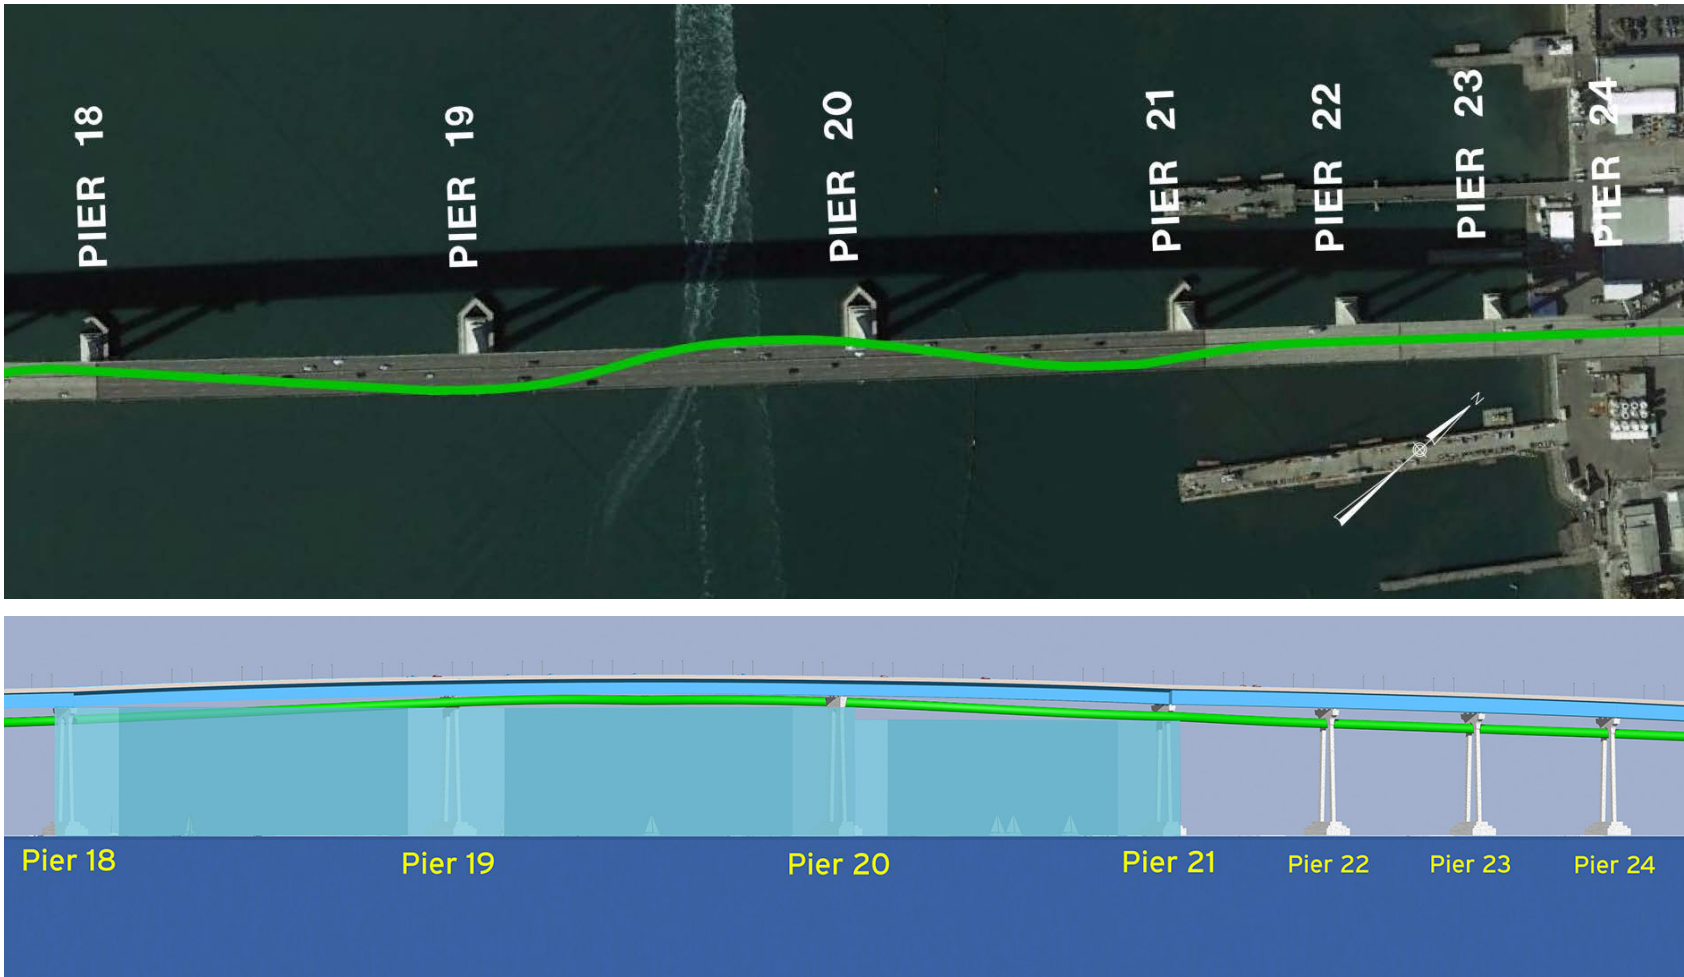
Initial Concept (shown in green) Pier 18 through Pier 24 – Mid-Span to Eastern Extent
